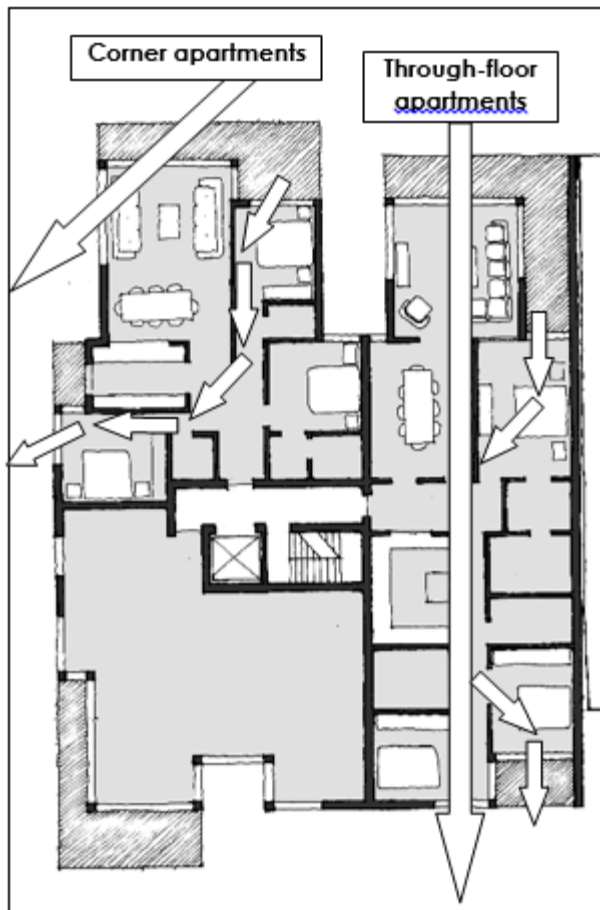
Apartment floorplans that encourage natural ventilation
